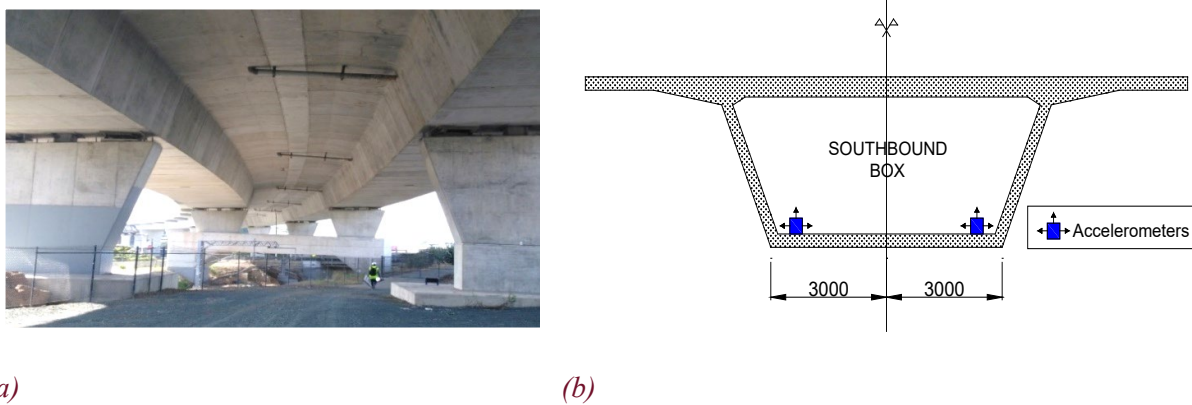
(a) A view of Newmarket Viaduct, and (b) sensor locations in girder cross section.
